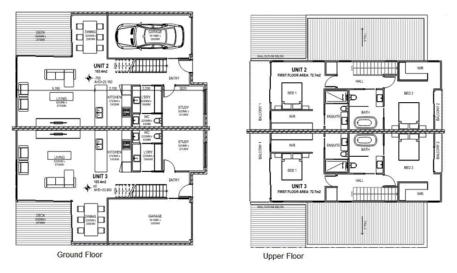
Ground and Upper floors of new units (Oramatis, 2021)
